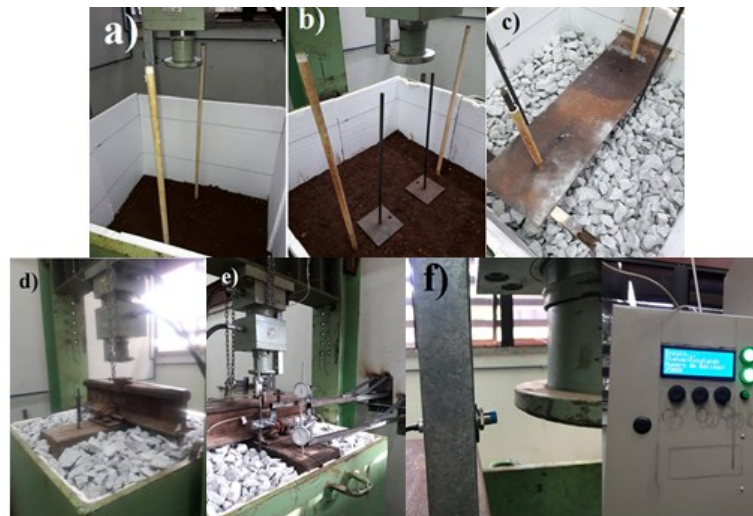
a) Pressure rods positioned on top of the subgrade layer; b) Reinforcement rods positioned on top of the sub-ballast layer; c) Placement of crushed stone; d) Installation of sleepers, rails and fastening elements; e) Installed extensometers; f) Runout sensor and counter.
